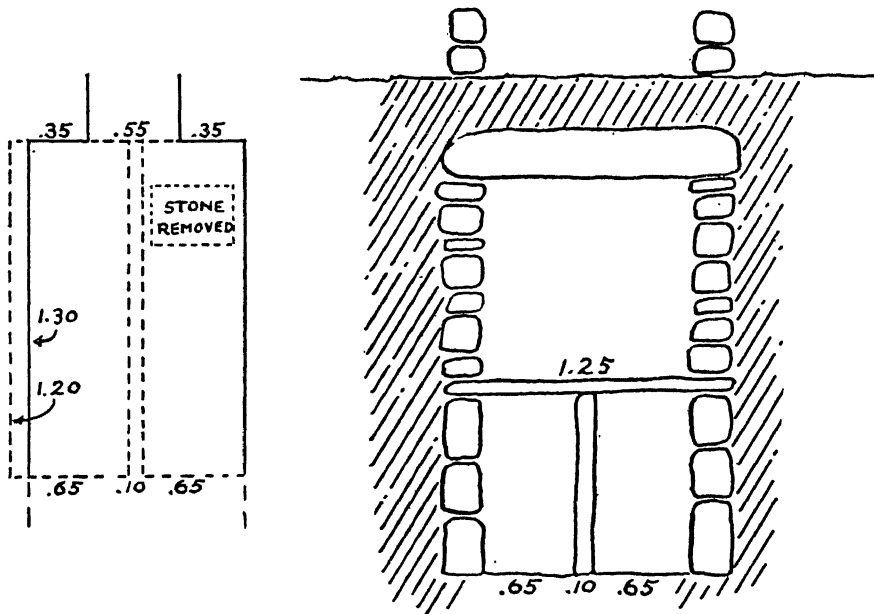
Groundplan and cross-section of house at Katak, Recuay, Site 4K-D.
